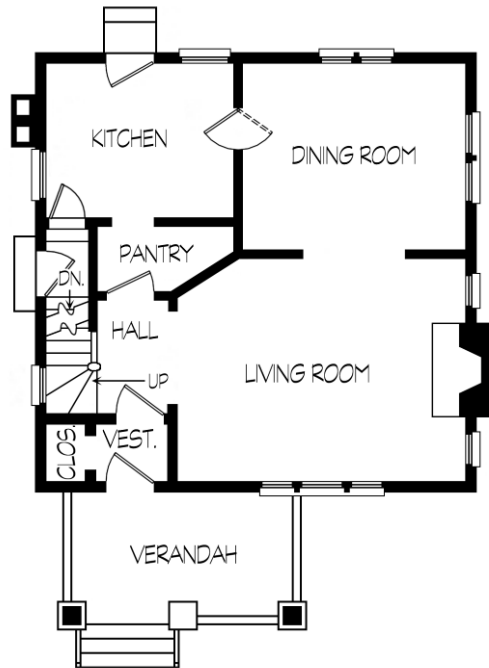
Bungalow Plan. Bungalows vary in plan arrangements – the living room in front might be undivided, for example, with the area behind divided into spaces for the kitchen, dining, bath, and bed rooms
